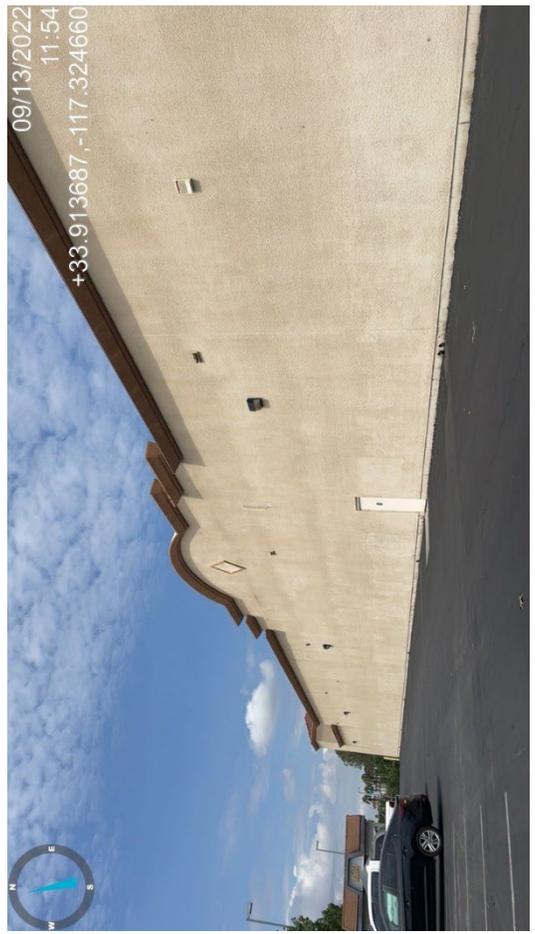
View Northwest of southern side of project site existing structure and active recycling center structure.
